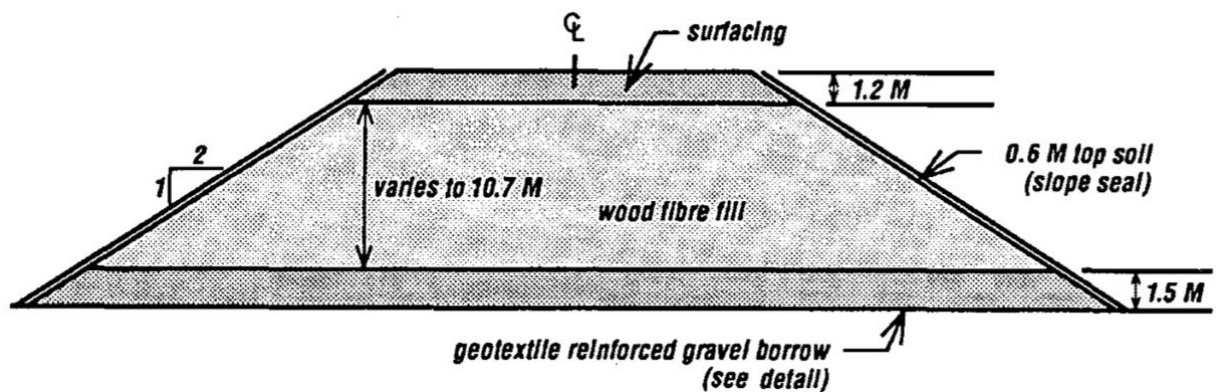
Cross section of wood fiber embankment (Allen and Kilian 1993).
